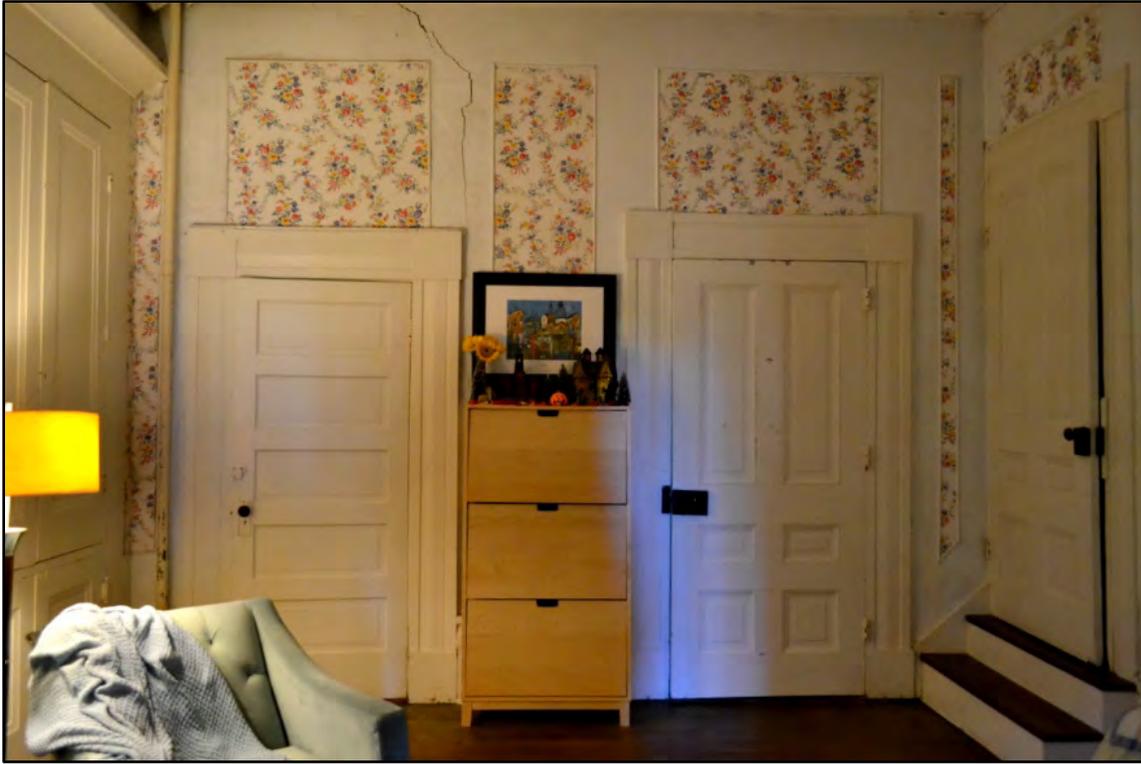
Rear wall of Room 4, with doors leading to porch on left, and bathroom on right.
